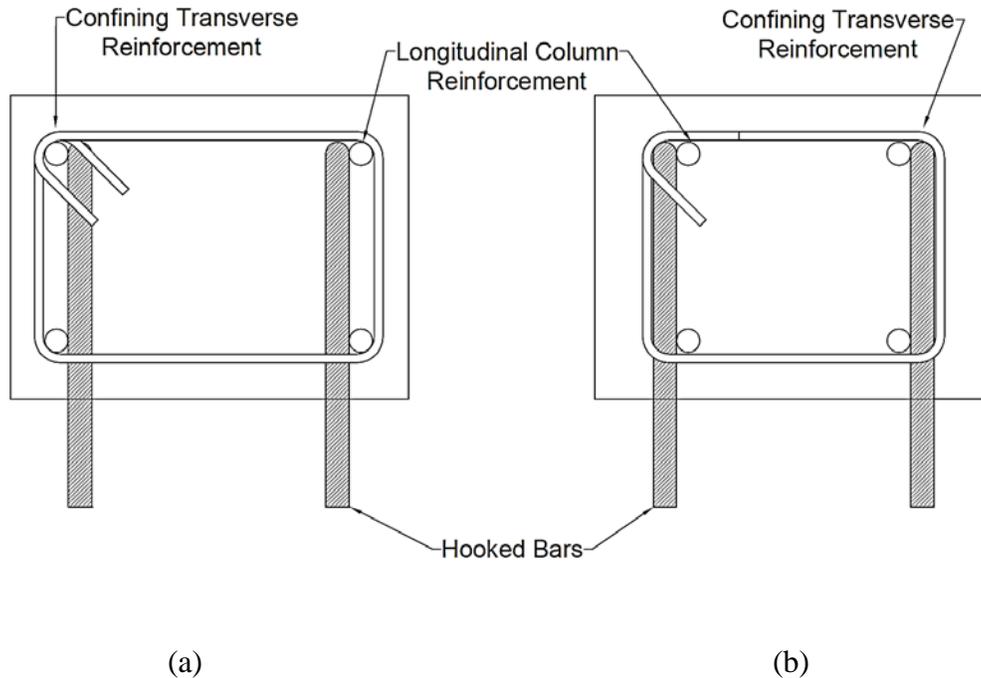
Cross section detail of specimens without crossties with hooks placed (a) inside the column core, (b) outside the column core.
